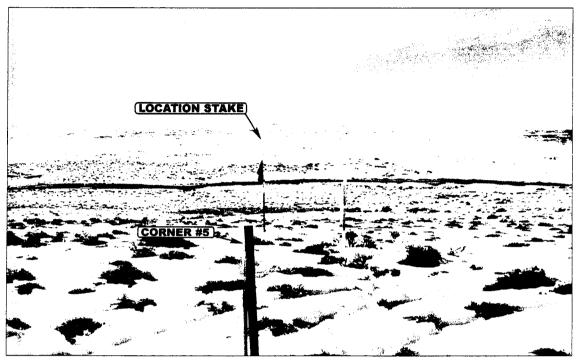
PHOTO: VIEW FROM CORNER #5 TO LOCATION STAKE
